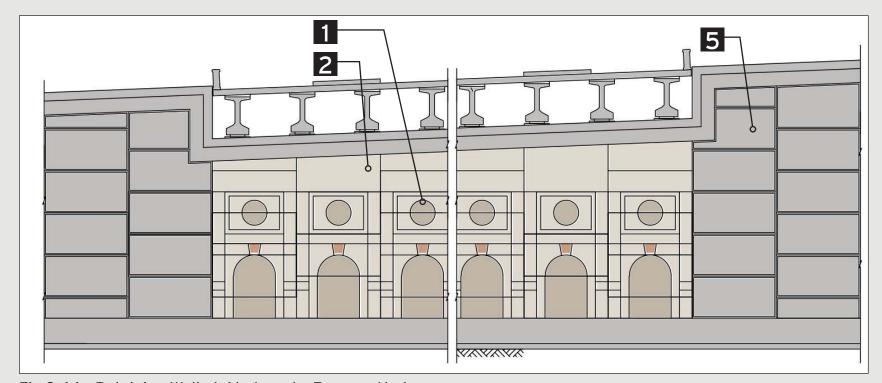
Retaining Wall at Abutment - Freeway Underpass
